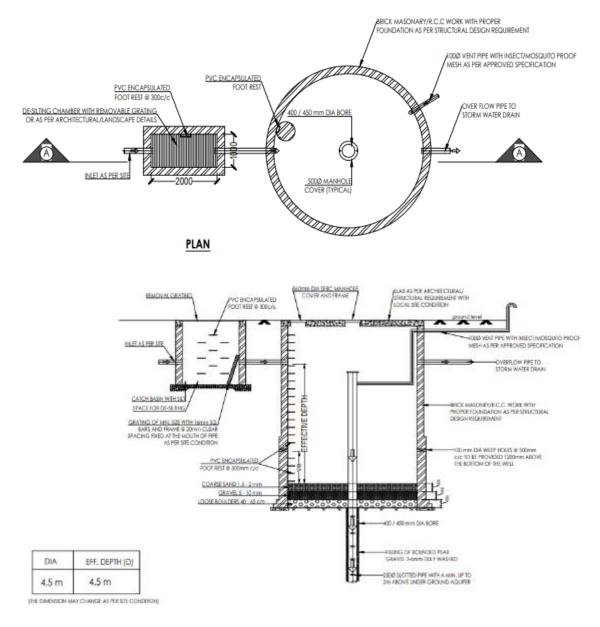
Design Details of Rainwater Harvesting pit proposed under Bone & Joint Hospital Project (Plan & Section)
